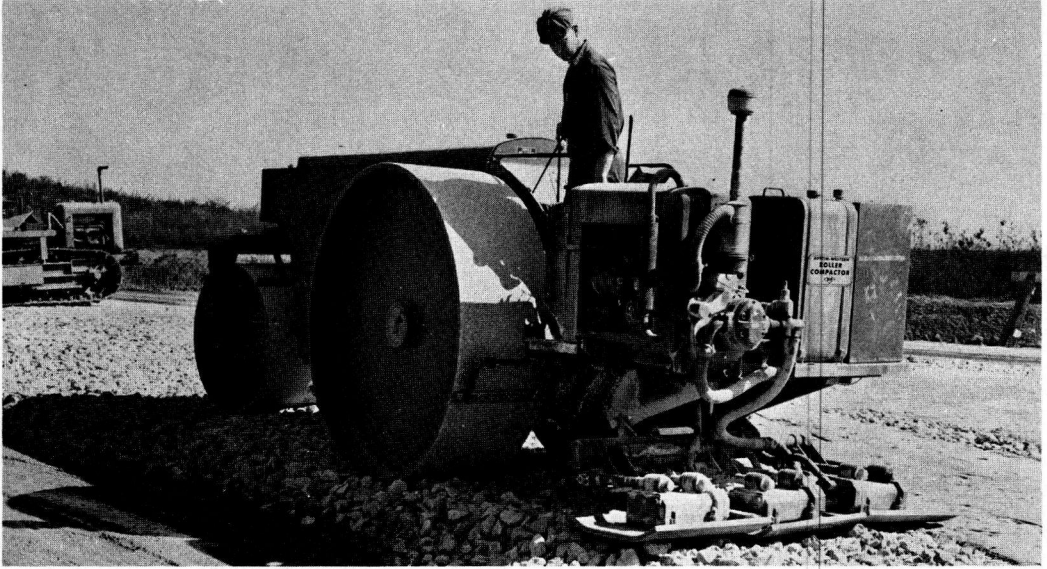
Three-wheel, smooth-wheel-type roller equipped with three supplementary vibrating base-plate-type compactors used in compacting crushed rock base course.
